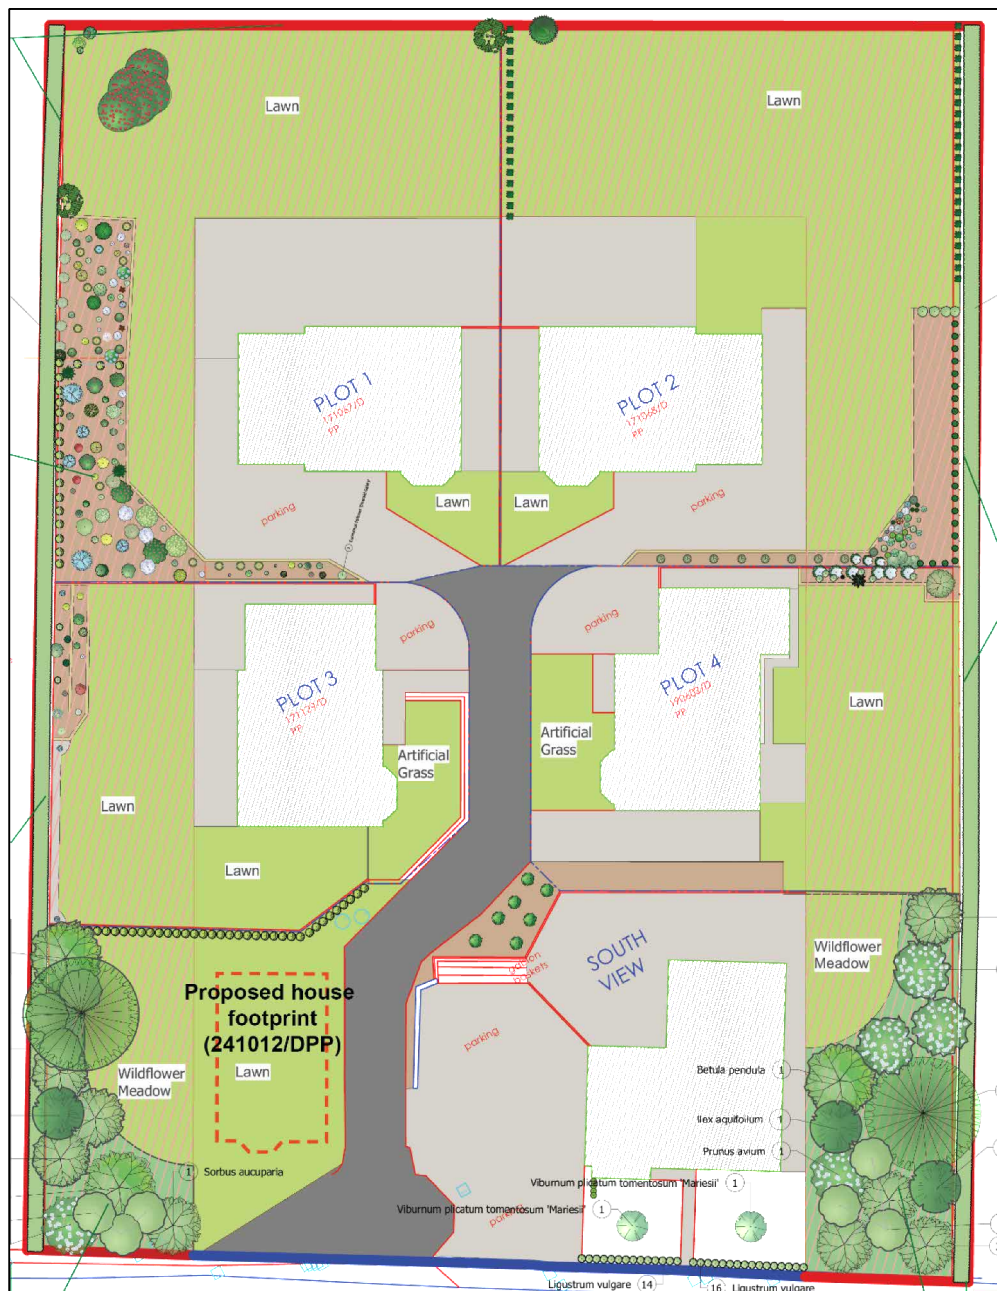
Approved Landscaping Plan from application 231313/DPP, with mark-up showing the indicative footprint of the proposed house (red dashed outline) (Source: ACC Application Website)
